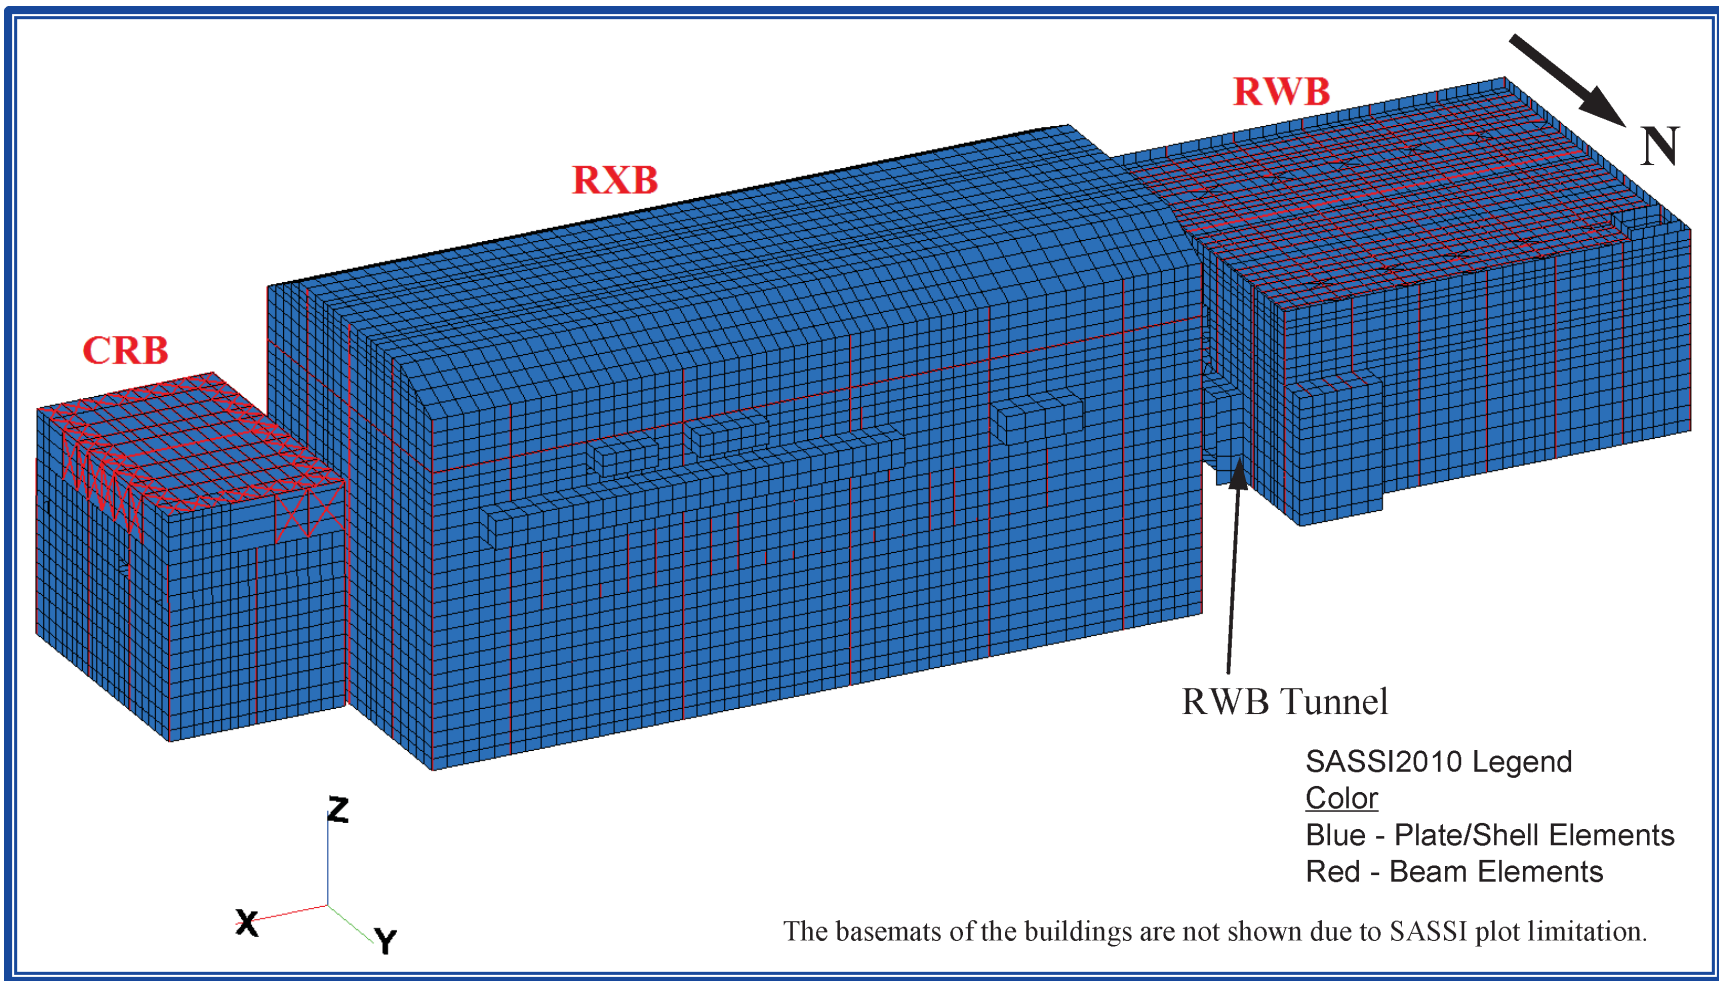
Beam Elements of SASSI2010 Triple Building Model
